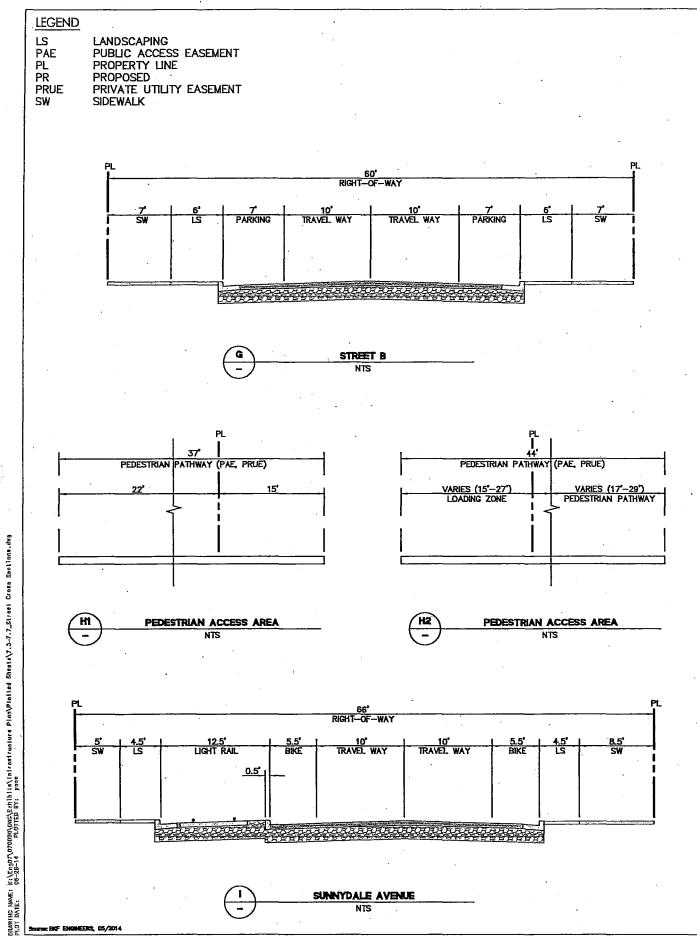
TYPICAL STREET CROSS SECTIONS
